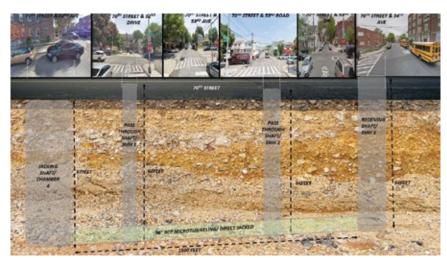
Profile/Street view of 70th Street 1,600-foot Alignment
